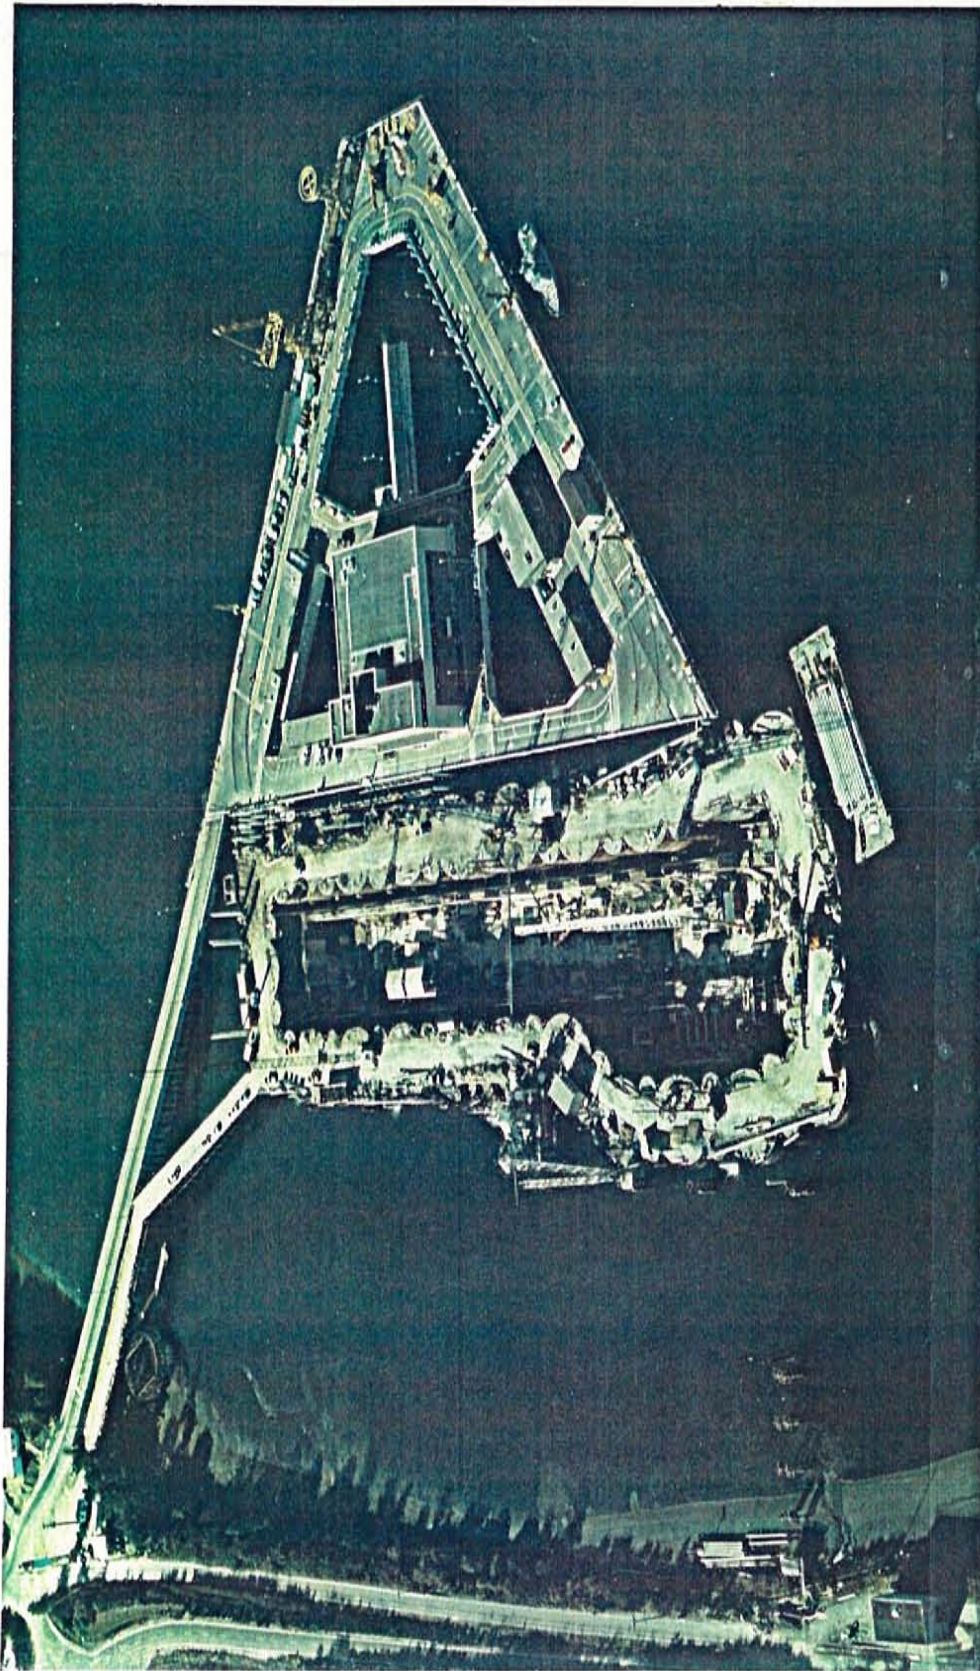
Plate I. Delta Pier: Two Refit Piers and a drydock, U.S. Naval Submarine Base-Bangor, Hood Canal, Washington.
